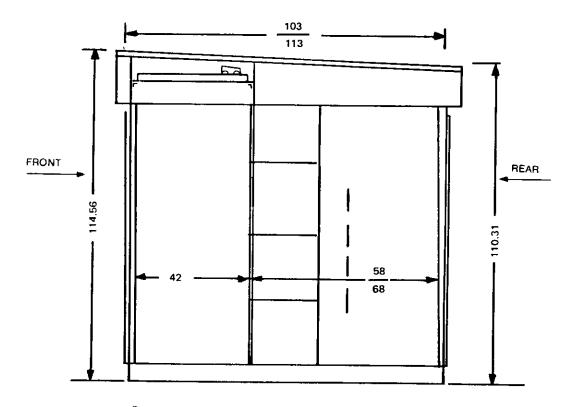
OUTDOOR WALK-IN ARRANGEMENT SIDE SECTION
